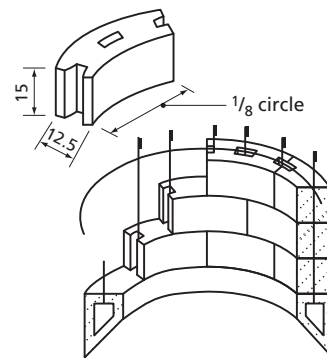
Section of foundation and reinforcement (courtesy of Erik Nissen-Petersen)
